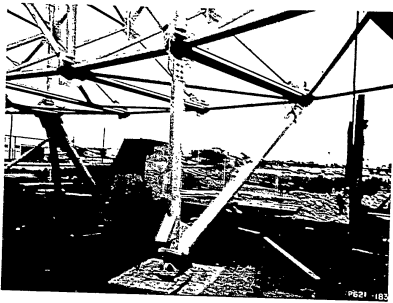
Front support leg bolted in place, showing base fitting and jacking pad. Rear support leg in background beyond spider arm test mount.
